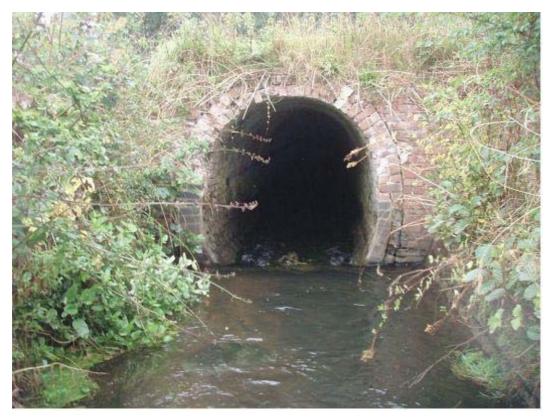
Head of 720 metre culvert taking 50% of the Glaven's flow on the Bayfield Estate (photo with thanks to Tim Jacklin, Wild Trout Trust).
